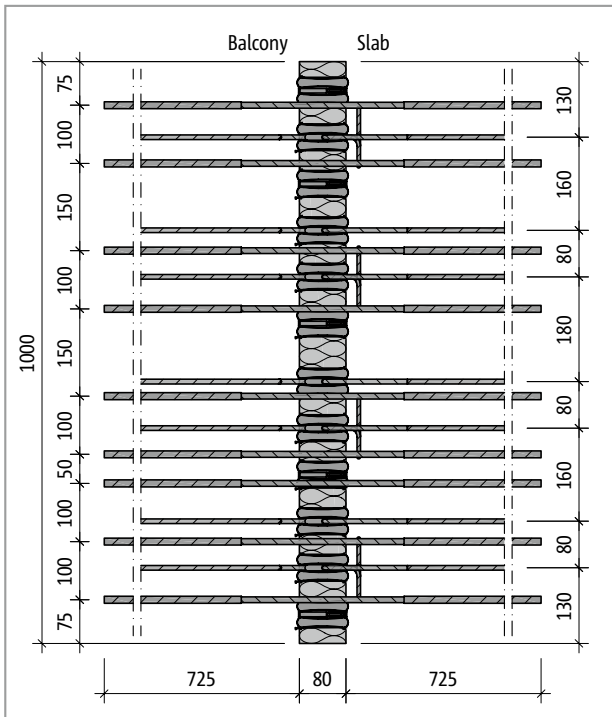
Schöck Isokorb® T type K-M8-V1: Product layout
